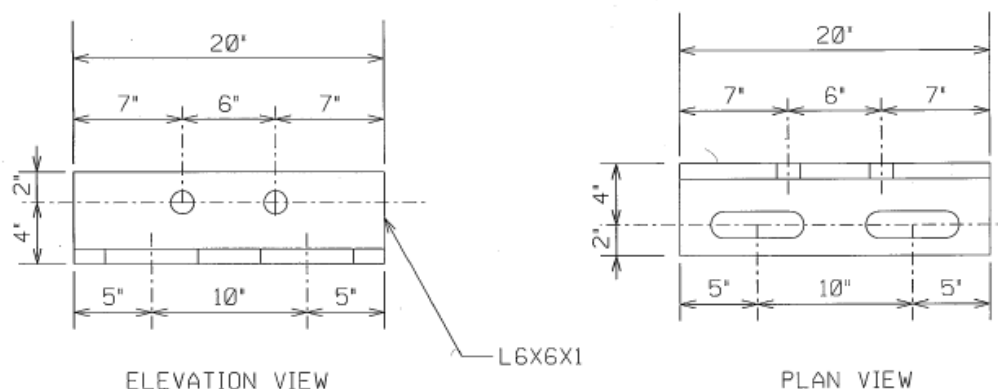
Little Bear Creek Abutment Connection (Expansion)
